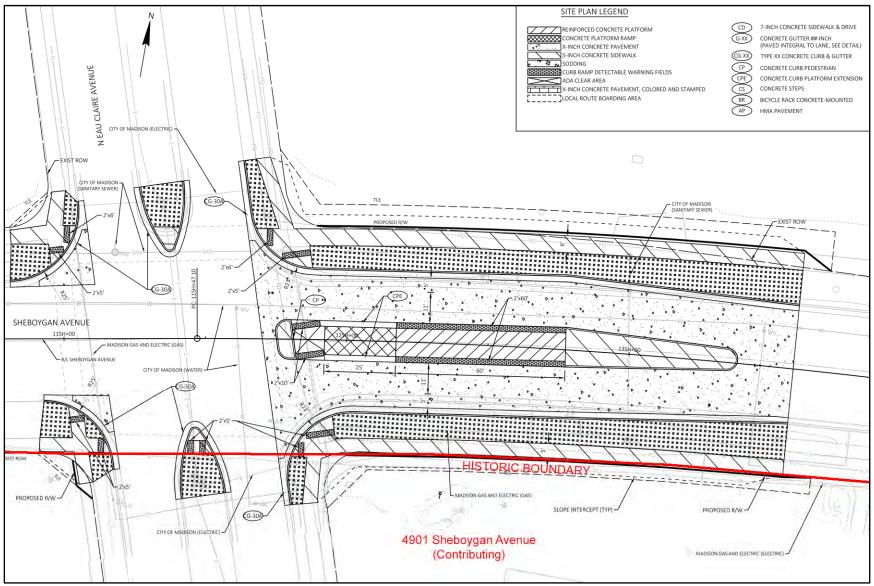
Sheboygan Avenue at Eau Claire Avenue – Plan View of Proposed Median Station
